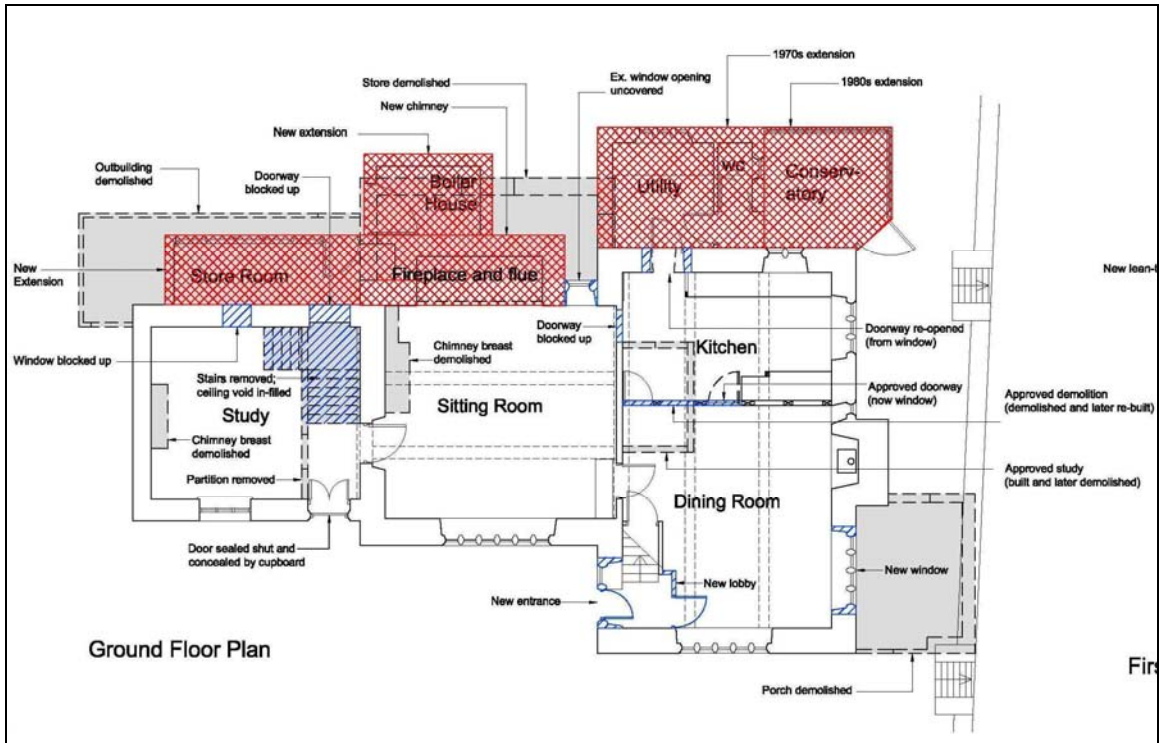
Ground floor plan showing 20th century alterations in blue and additions in red (Hayes and Partners)
